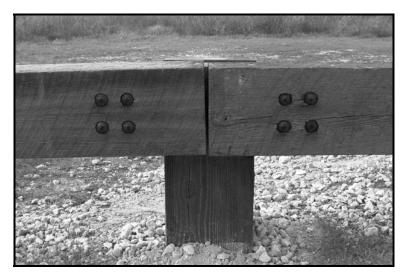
View of Type A Steel-Backed Timber Guardrail Post Splice
